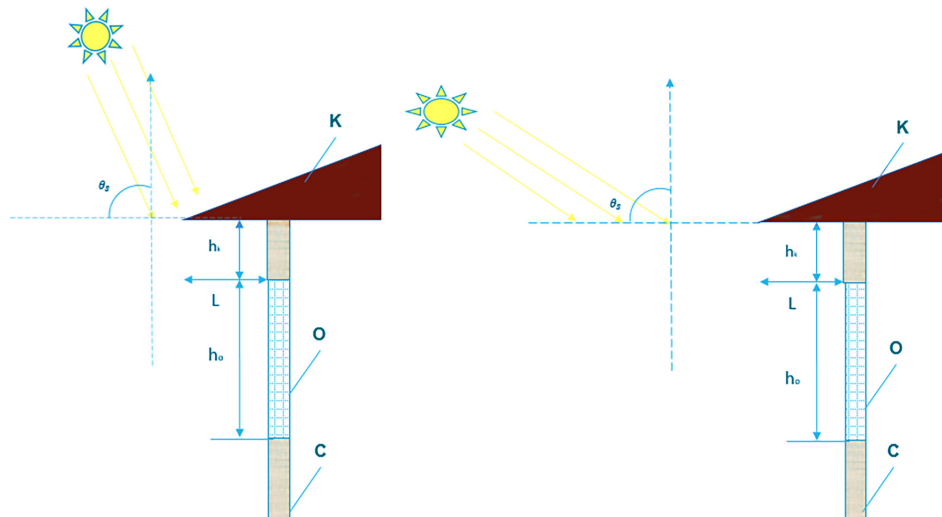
Scheme of the optimal arrangement of the roof and windows of the building
